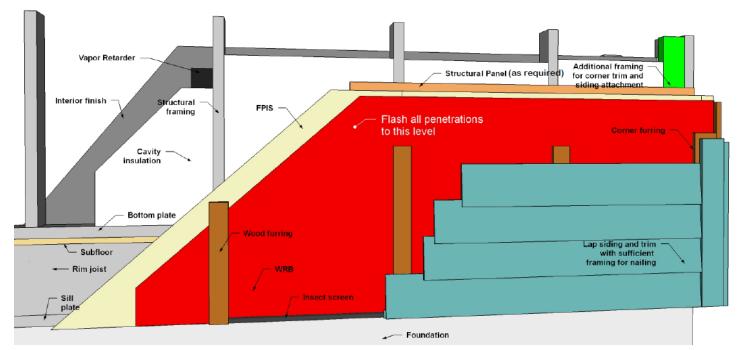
Wood-Frame Wall with Structural Panel Bracing (as required) and Exterior Finish of FPIS, WRB, Furring, and Lap Siding
